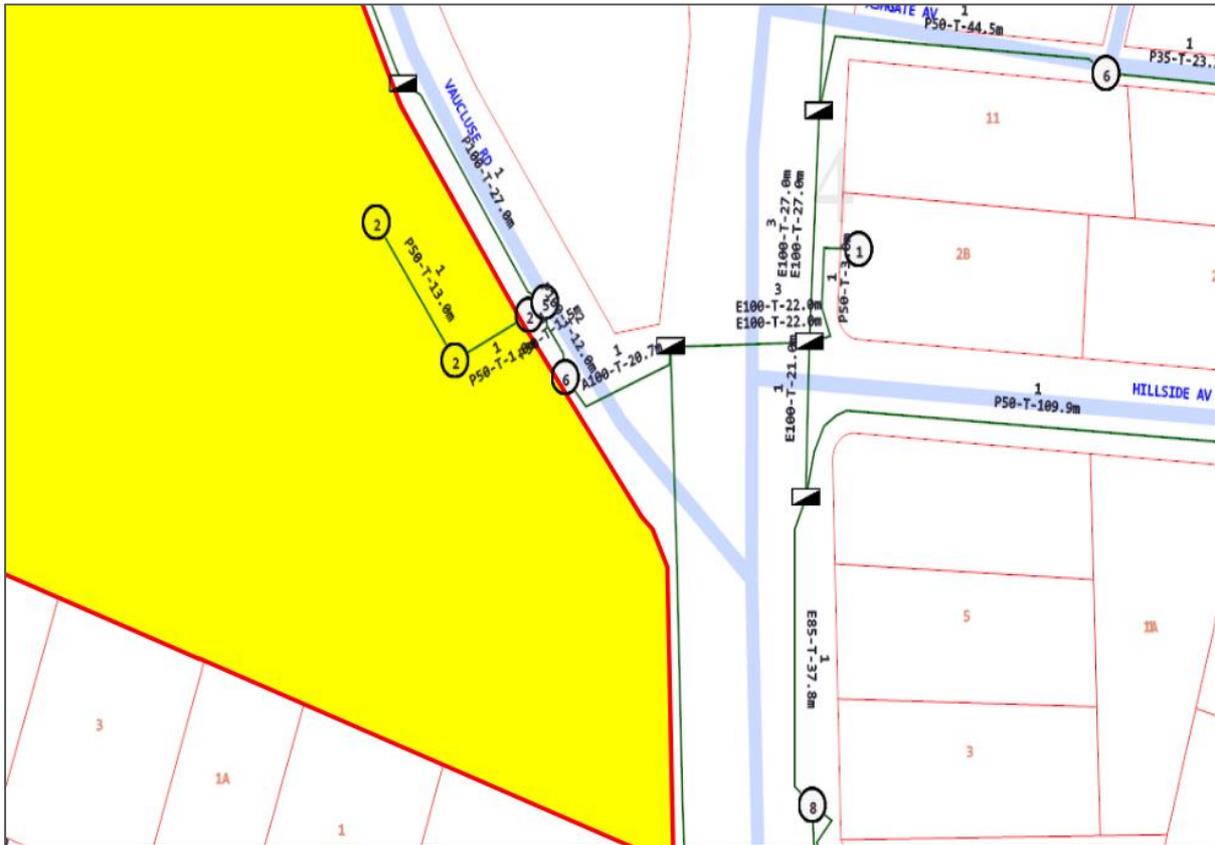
NBN Pit and Conduit Routes (School site highlighted in yellow)
